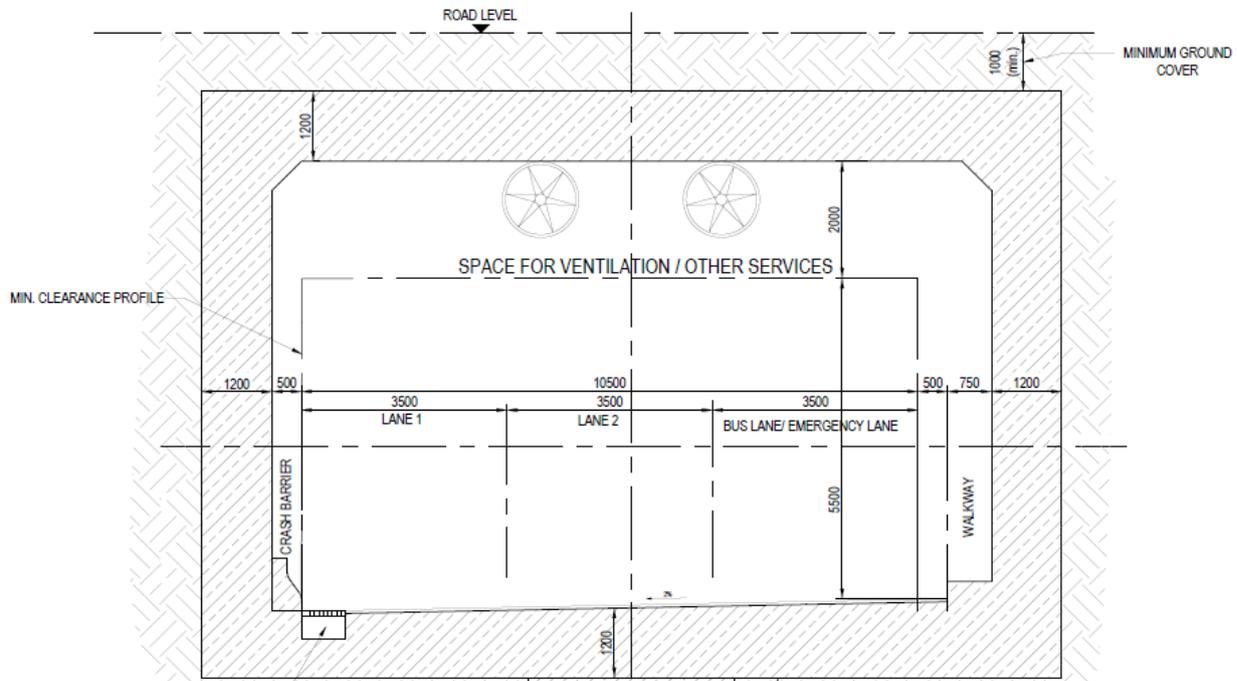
Typical Cross Section C&C Structure (3 LANE)
